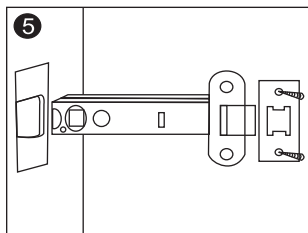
Fix the tubular latch/deadbolt complete with the loose faceplate into the door with the screw provided, ensuring the spindle passes through freely into the latch body. Fix handles, making sure to cut the spindle to the required length.
